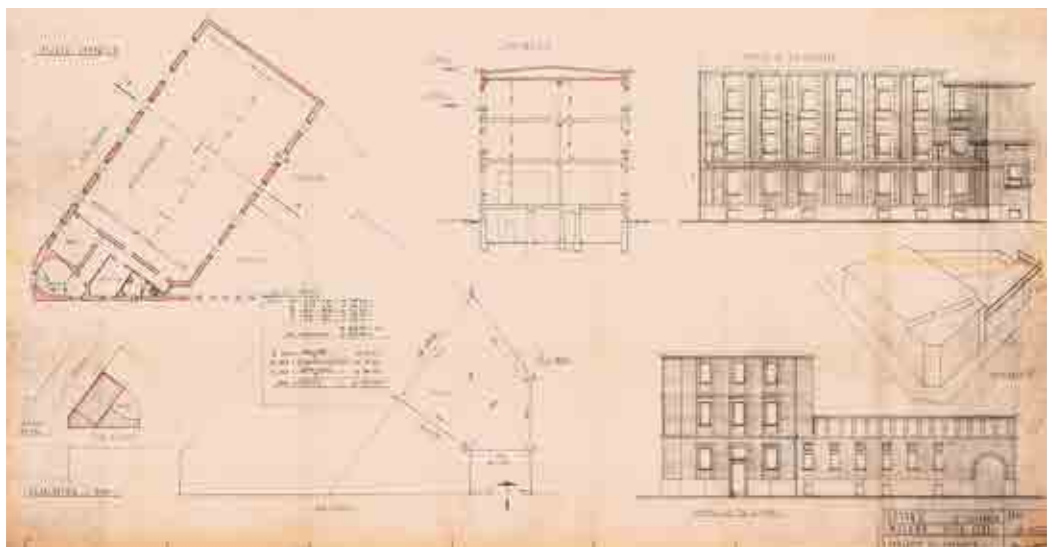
Project for the elevation of the Città Studi building dated 1962: a floor was added to the central body on Piazza Leonardo, while the roof of the 'automatic room' was demolished on Via Spinoza to add two more floors (Castagnoli Family Private Archive).
